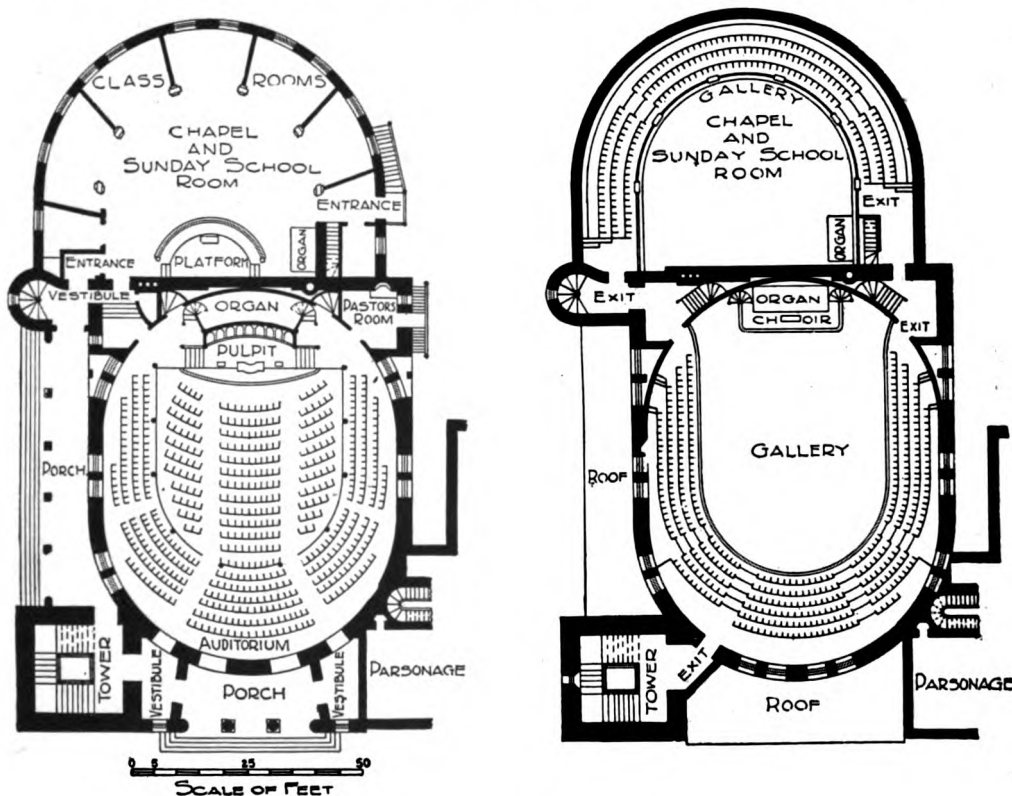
FIRST M. E. CHURCH, BALTIMORE, MD. OVAL AUDIENCE HALL PLAN. McKim, Mead & White, Architects.
